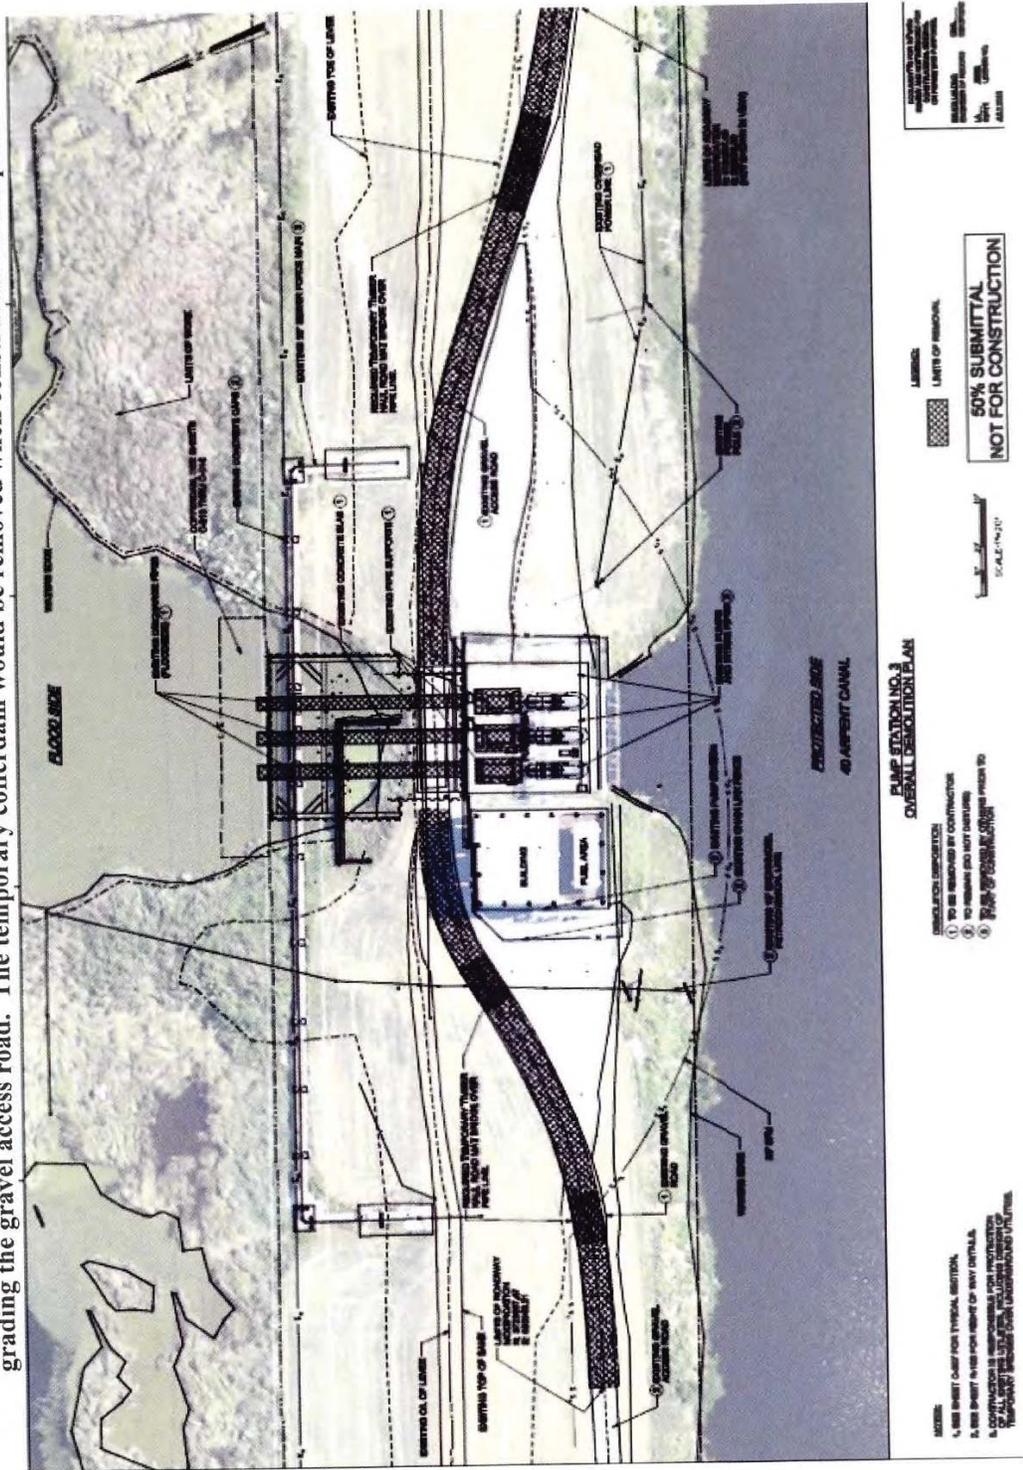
PS #3 Bayou Villere proposed seepage repairs include the replacement of discharge pipes, floodwall T-wall, and re-grading the gravel access road. The temporary cofferdam would be removed when construction is complete.
